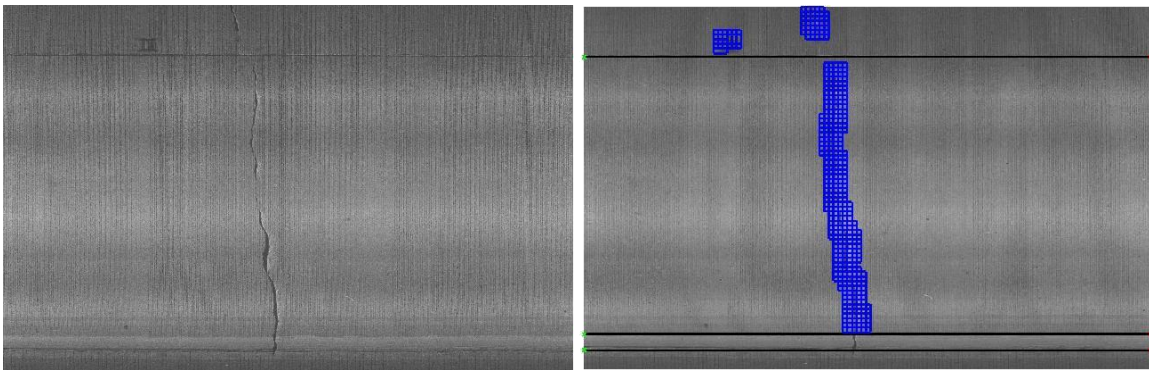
Example 1 of concrete crack at high severity: raw crack (left) and crack detection (right)
